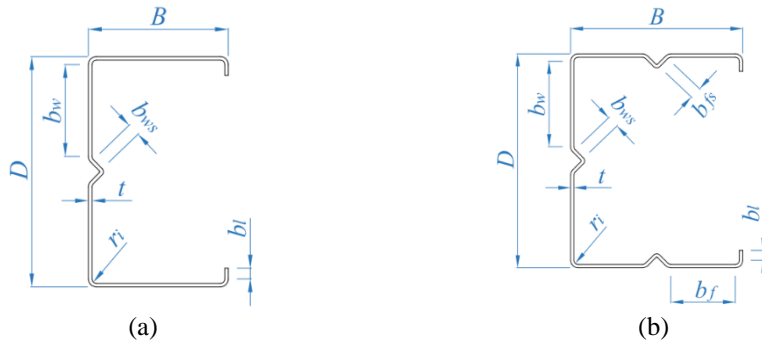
Cross-section shapes and dimensions of (a) web-stiffened, and (b) web-flange-stiffened lipped channels.
